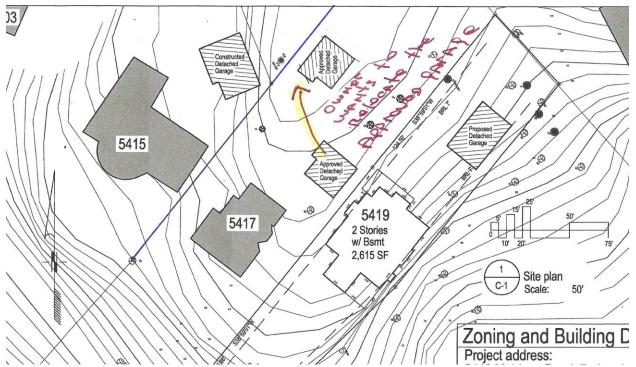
partial site plan showing the approved and proposed location for a three-car garage at 5417 Mohican Rd.
